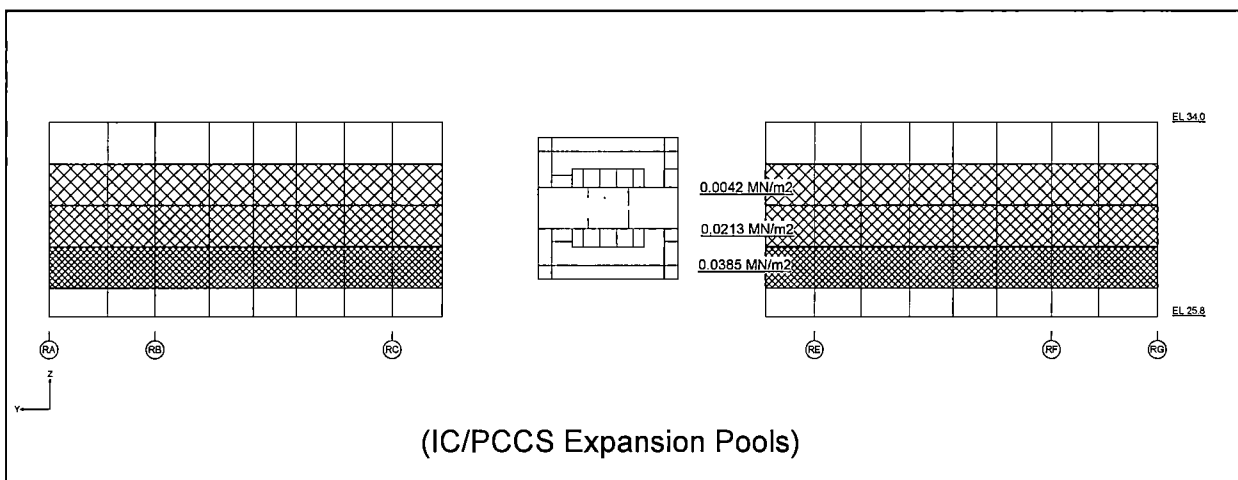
Hydrostatic Loads on the Inner Wall at EL 27,000 (R6)
